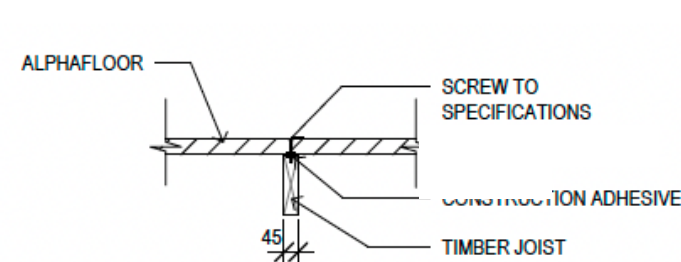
ALPHAFLOOR® Fixing at end of panels to Timber Joists
